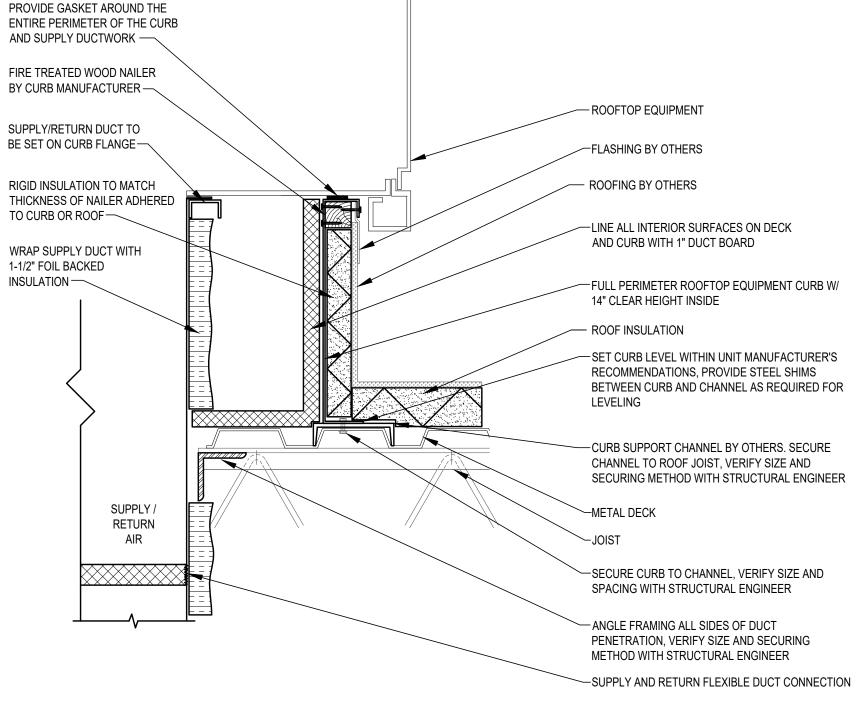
SEAL ALL JOINT PER MANUFACTURER'S REQUIREMENTS. SCREWS MAY NOT PENETRATE DUCTWORK.
